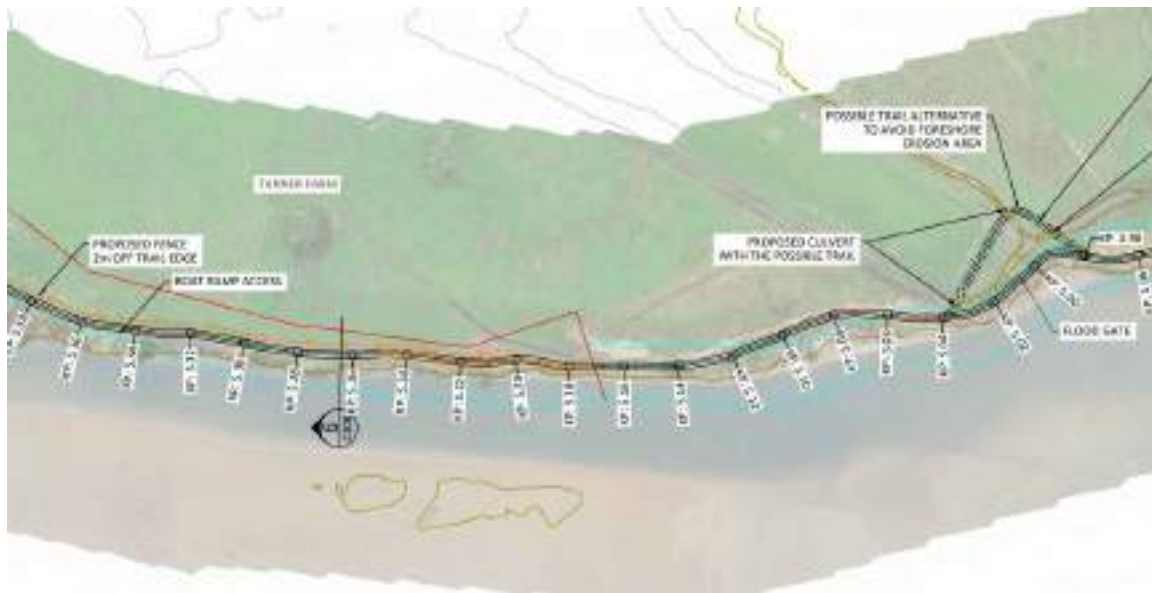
Trail set out from KP: 4.98 to KP: 5.38.
